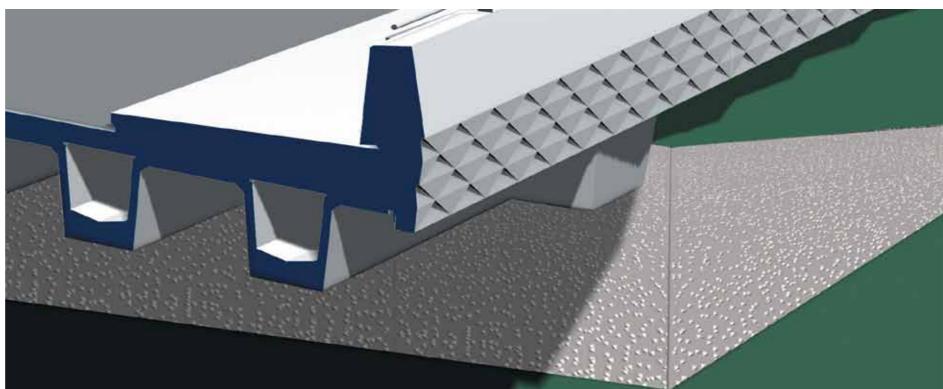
Great South Road leading edge barrier showing geologic rusticated split abutment
